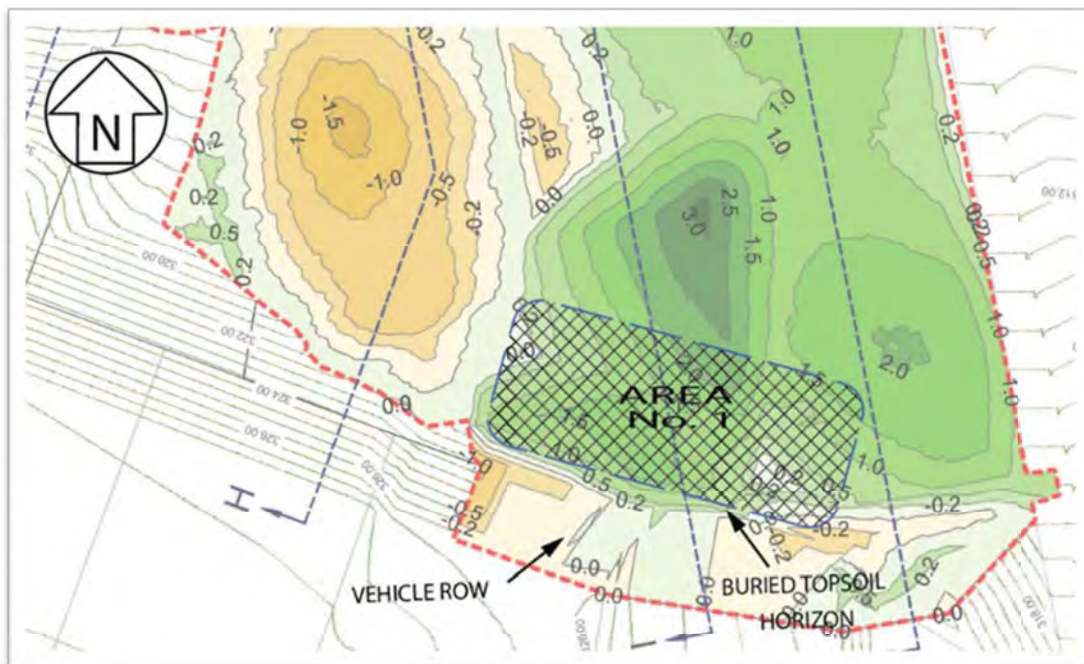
General location of engineered fill under construction relative to proposed earthworks plan
